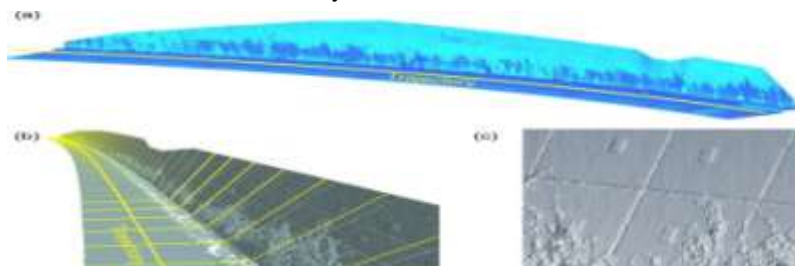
Point cloud (a) and TIN model (b) of the highway surface and retaining wall.
